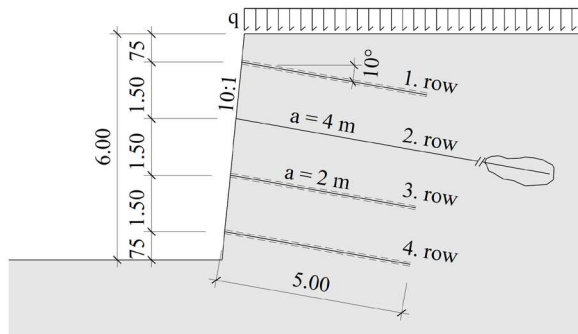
Prototype of a soil nail wall combined with prestressed anchors. All units in m.
